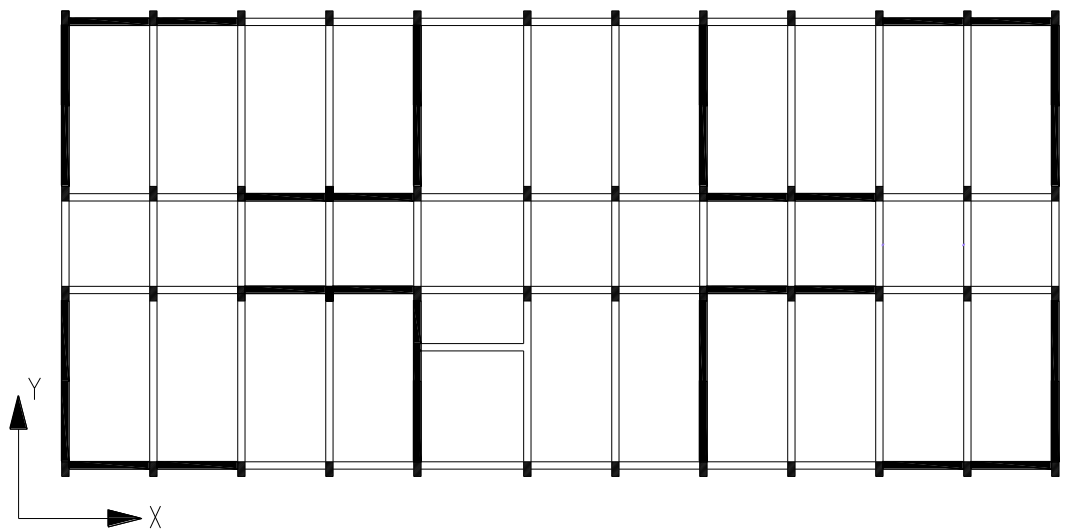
Plan View of the Designed Building with 2.0%-2.0% Shear Wall Ratio
